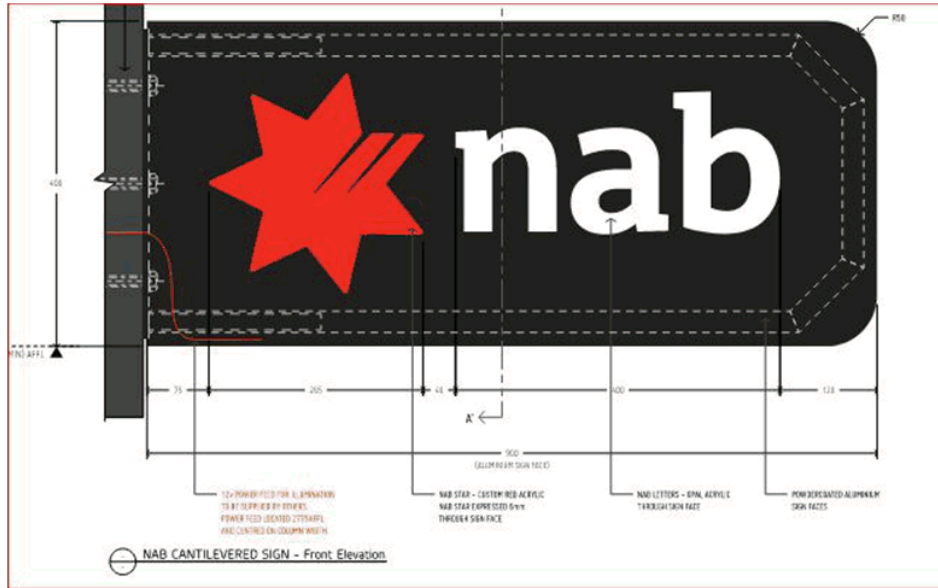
proposed horizontal wall sign to be attached to the Liverpool Street and Elizabeth Street Mall elevations
